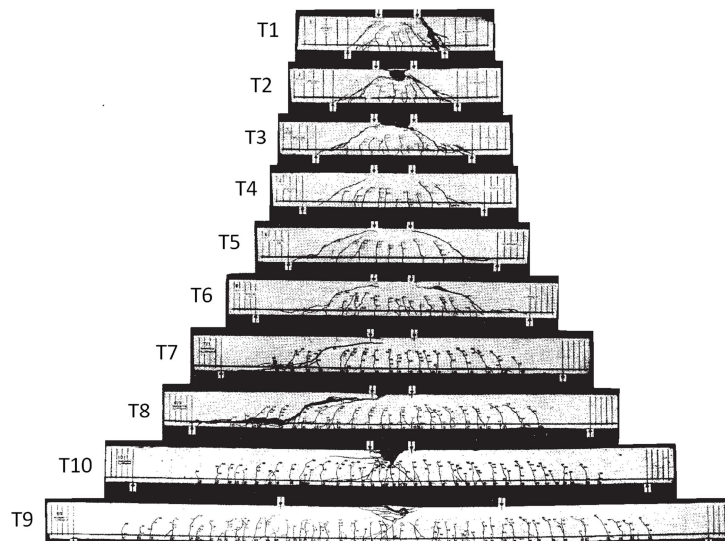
Cracks and failure pictures of beams, Leonhardt and Walther[158]
